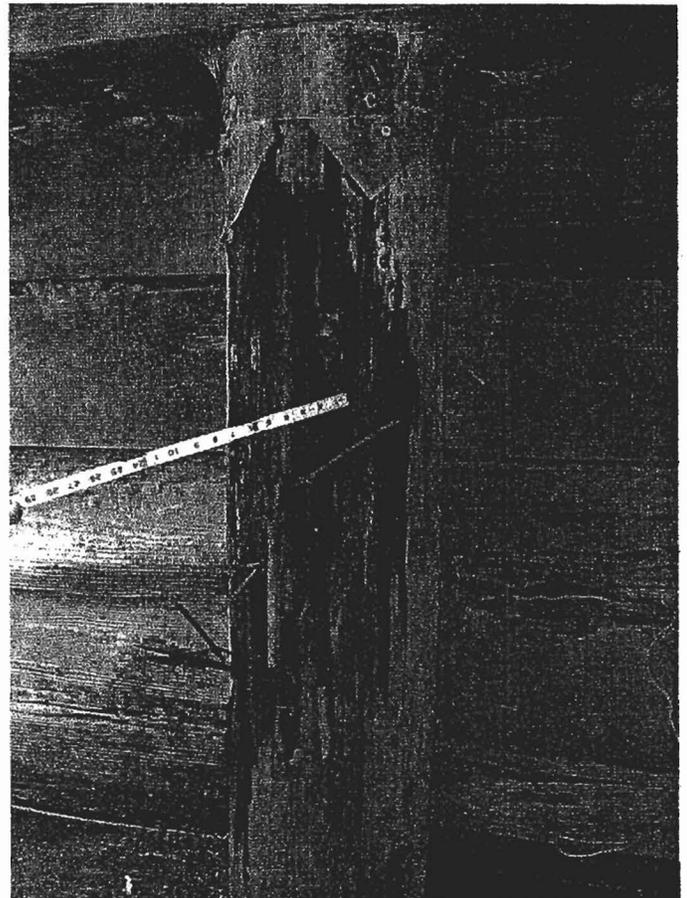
(right) – Decay in Pile 1 at the East Abutment.
